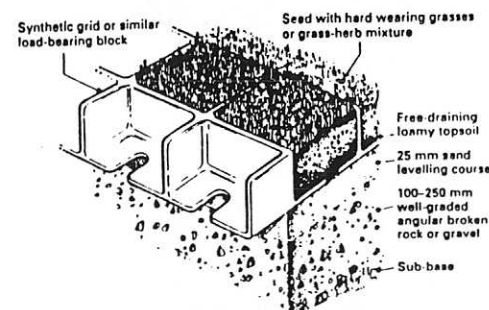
Plastic surface reinforcement for car parks and footpaths. Similar installation applies to perforated concrete slabs
